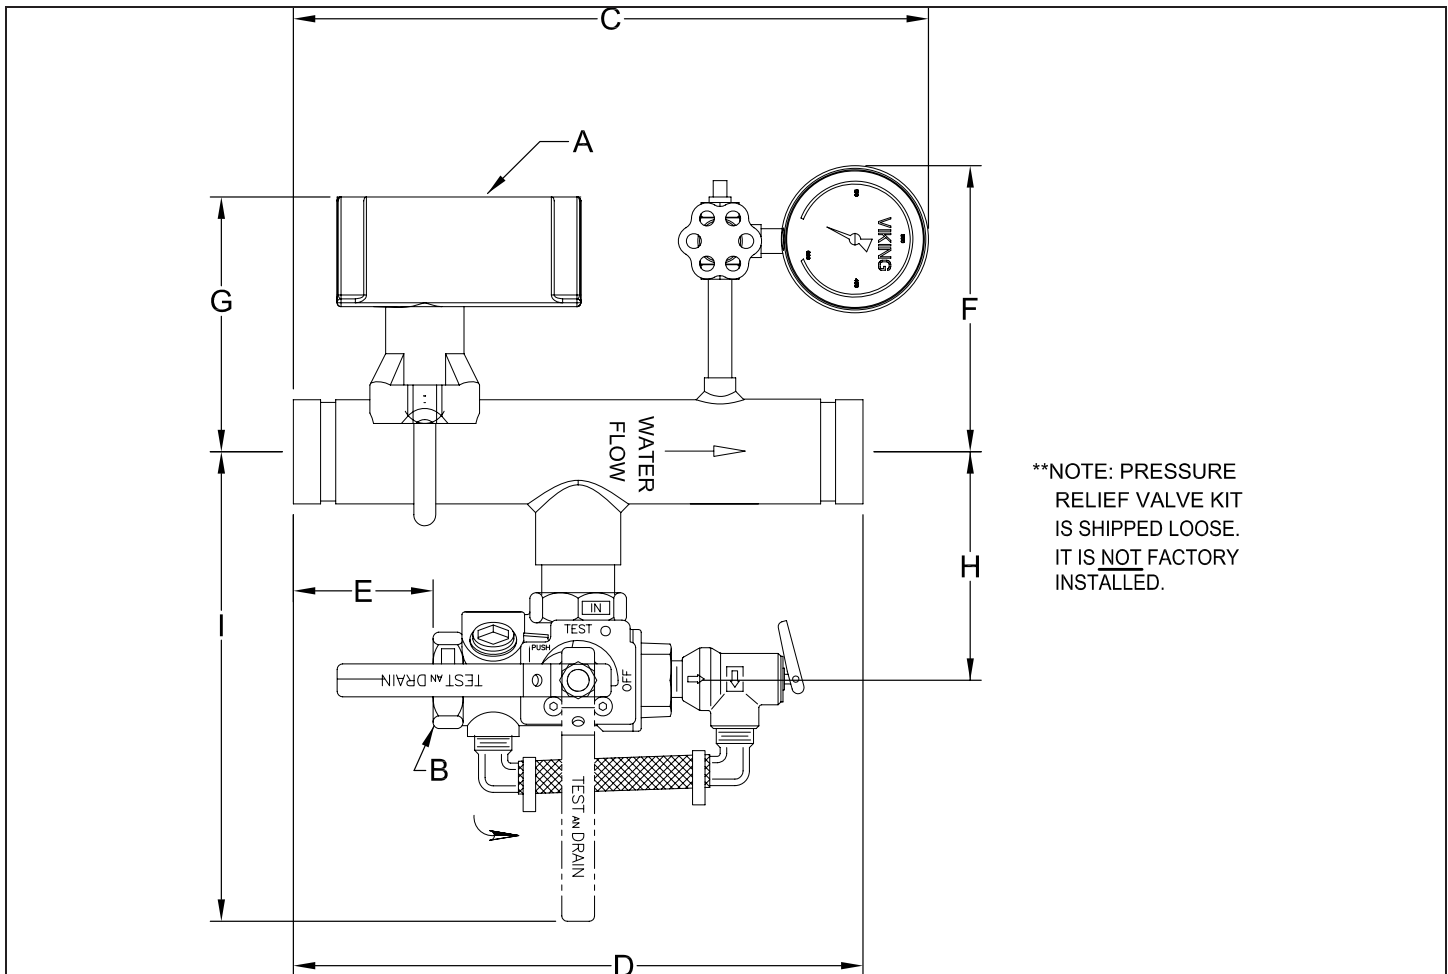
Floor Control EasyPac with TESTanDRAIN and PRV
